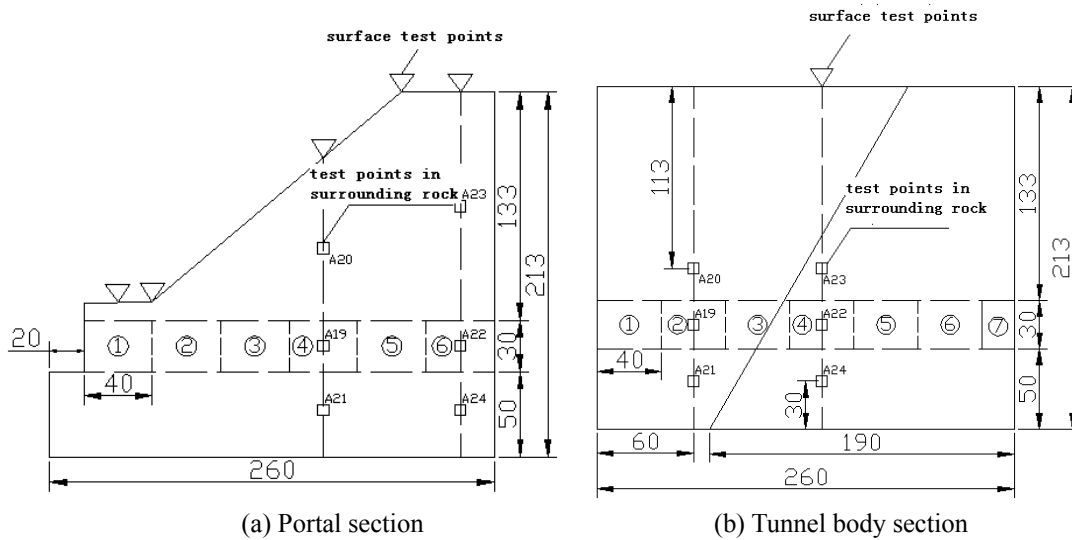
Front view of the arrangement of test points in tunnel and surrounding rock
